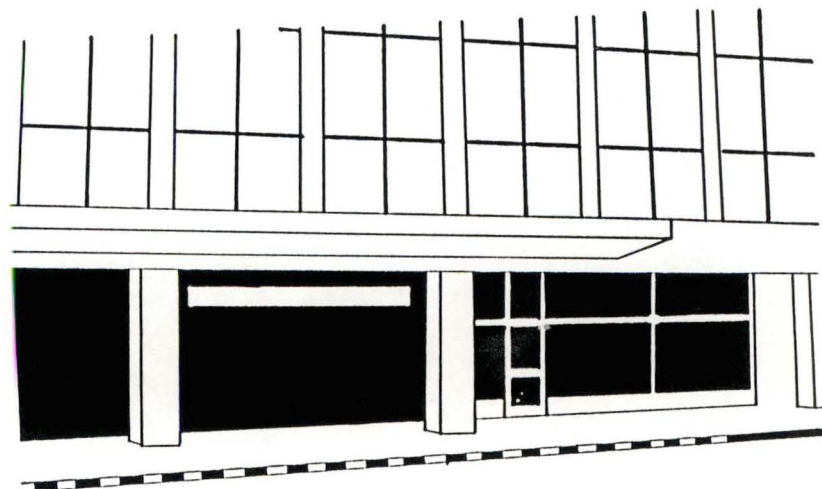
The T.B.T. Building, Murray Street level facade
